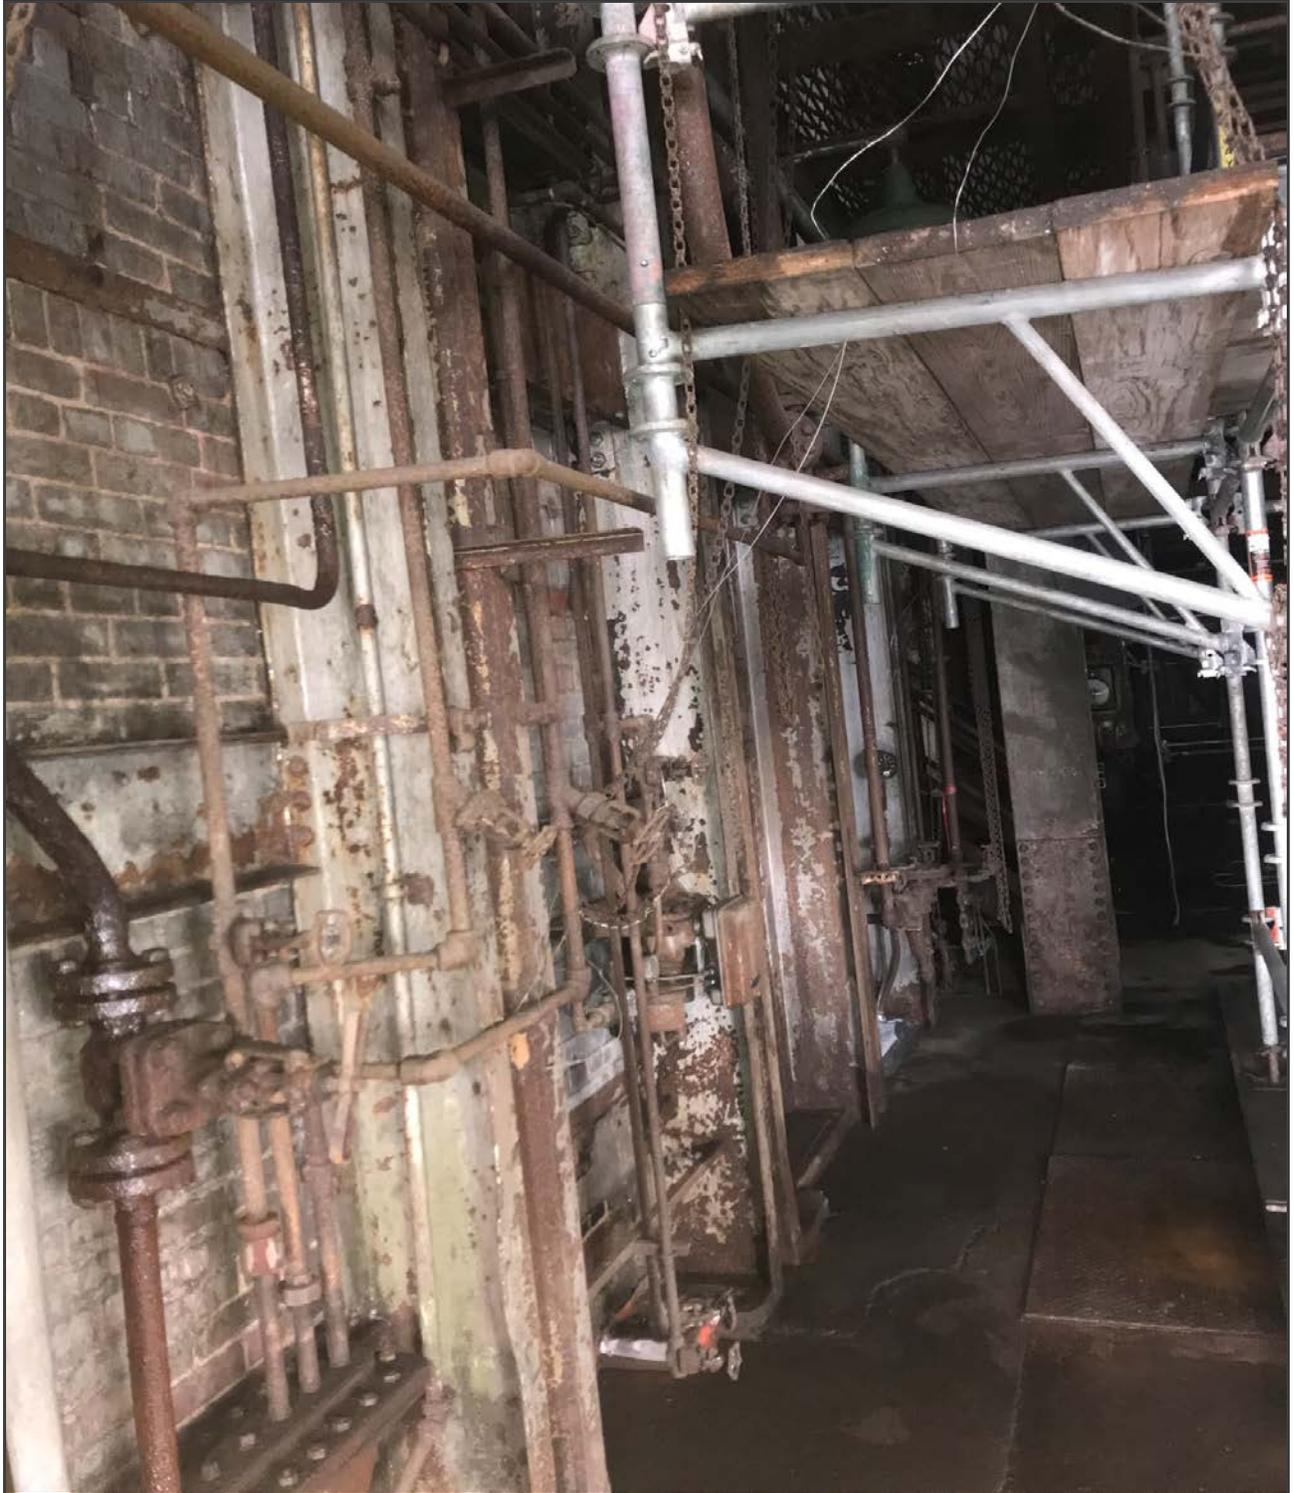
2nd Floor Boiler 1-12 Area – West Side – Facing South
